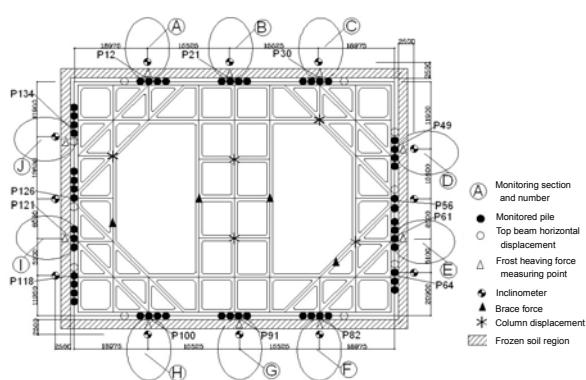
Monitoring system of the south anchor foundation pit of the Runyang Yangtze River Highway (Suspension) Bridge (unit: mm)
